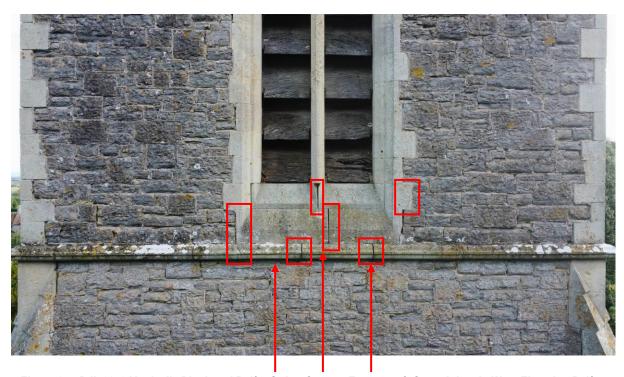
DJI_0250 Vertically Displaced Belfry String Course, Fractures & Open Joints in West Elevation Belfry Window
